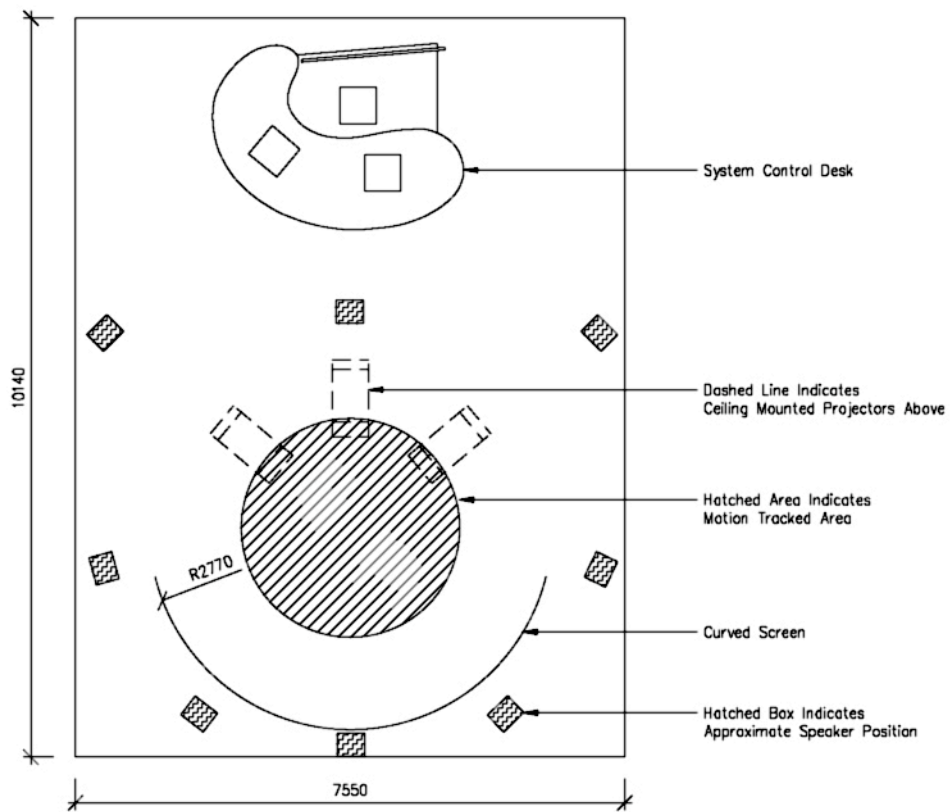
Floor plan of Virtual Reality Centre (VRC) at RMIT.
